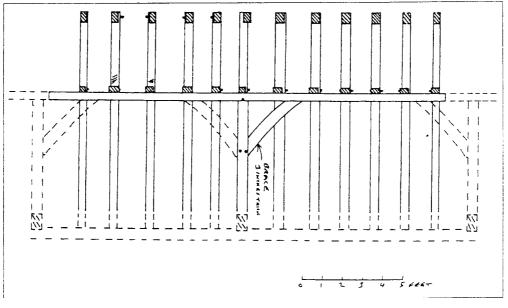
4 medieval roof in Head Street, Colchester - Long section from Front
